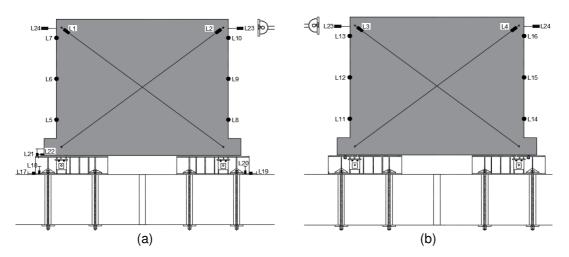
Instrumentation of the specimen for (a) exterior leaf (b) interior leaf.
